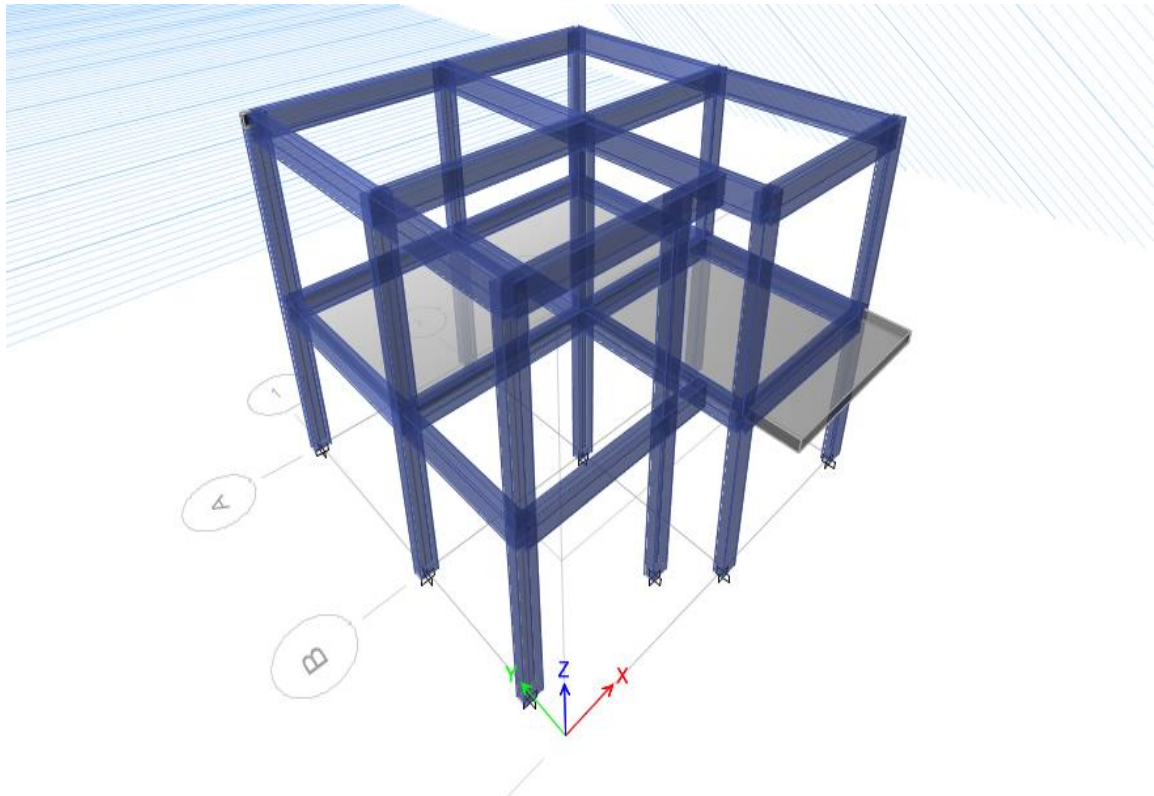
Structural modeling layouts for concrete frame (ETABS 2016 Ultimate 16.2.0)
